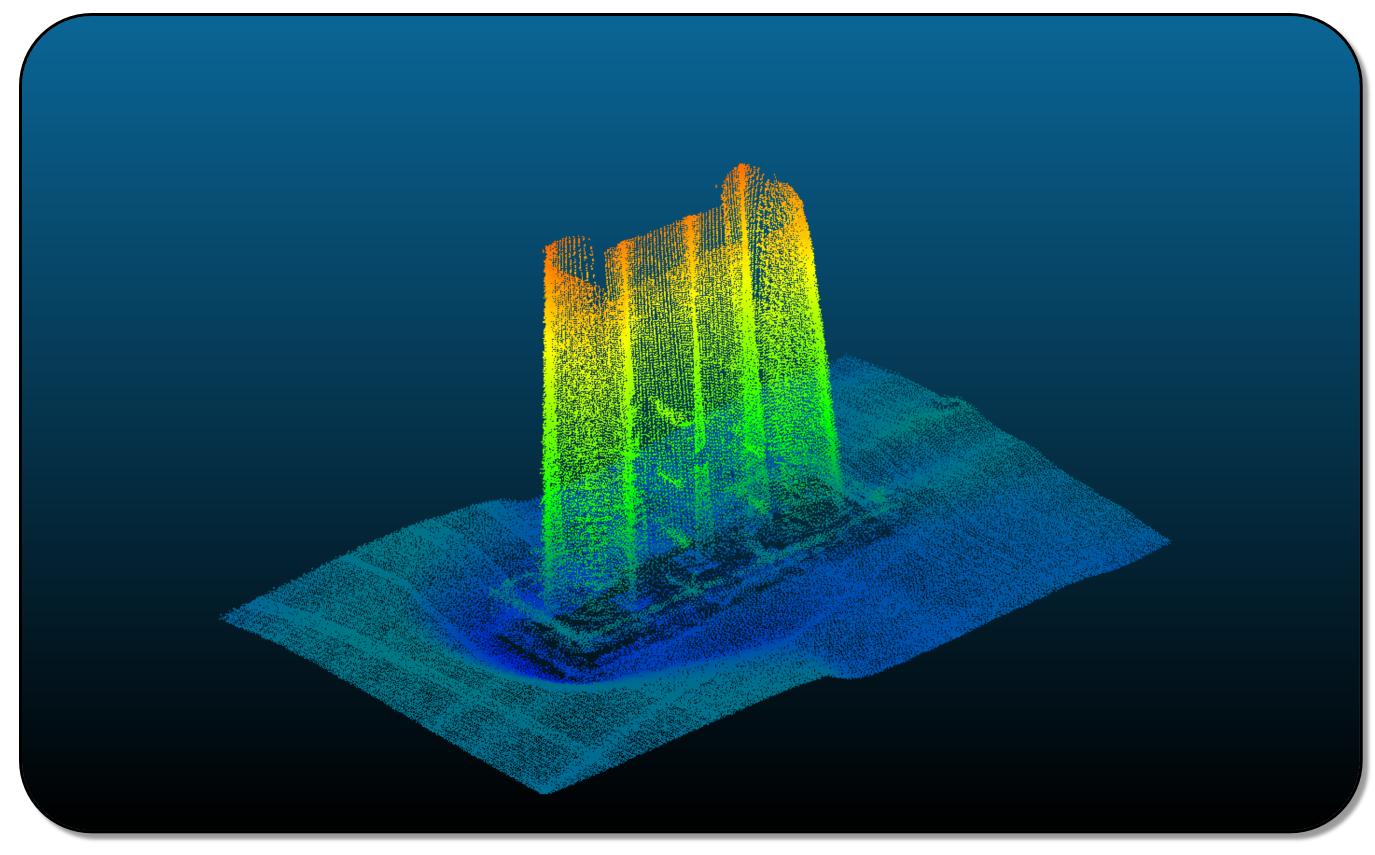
Perspective view of Pier 13 point cloud (looking from the northeast direction).
